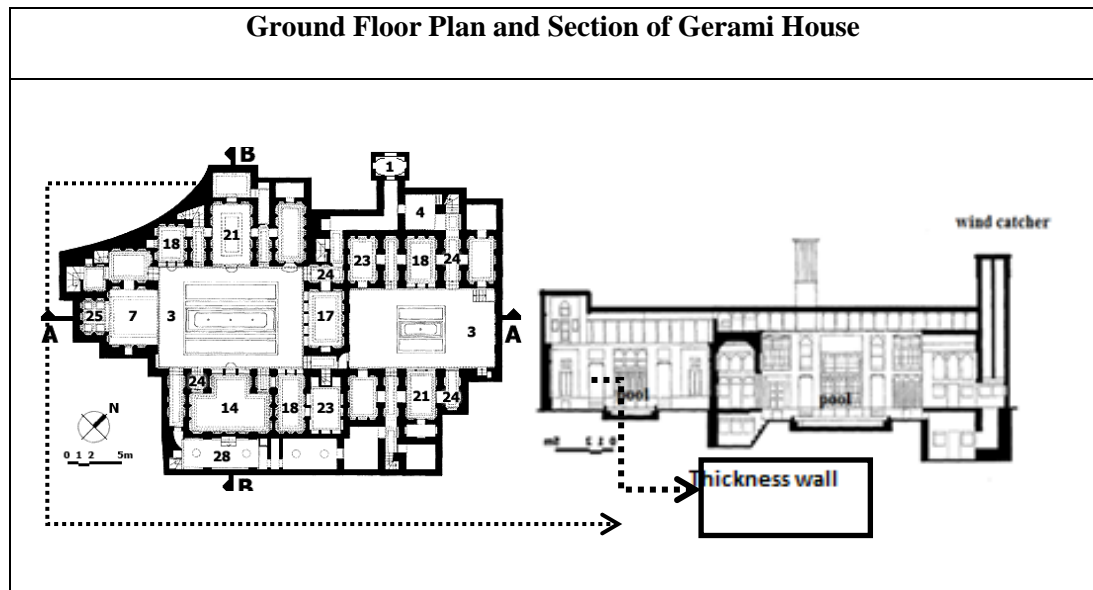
Ground floor Plan and Section of Vernacular House in Yazd (Memarian, 2006)
